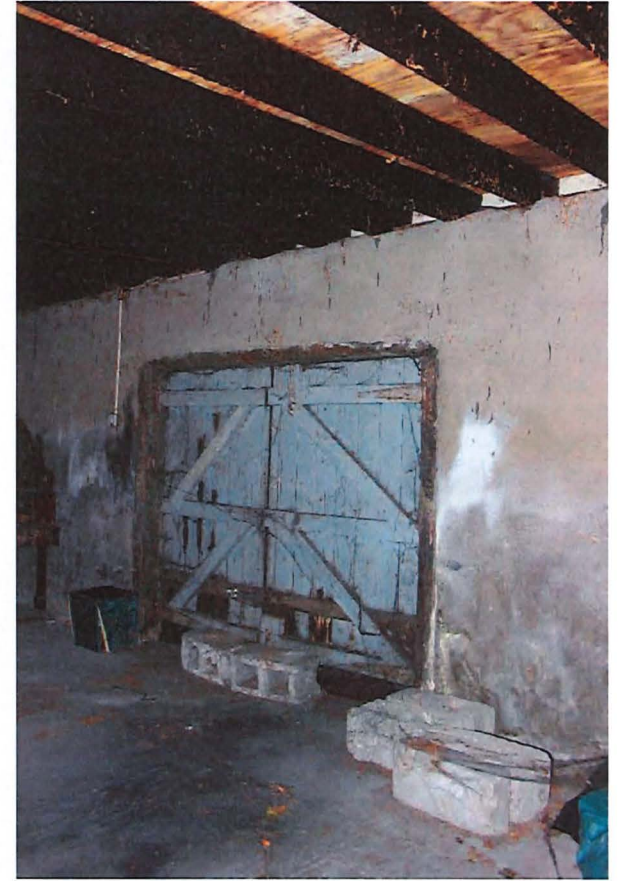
& 54 & 55– Room 3-05, looking south and southwest. Post 1975 shed with concrete floor slab and cementitious plaster.
